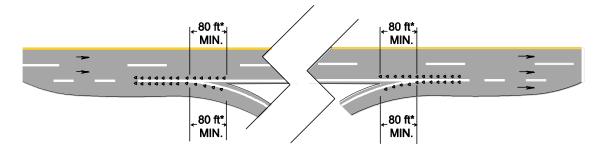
B-V2. Typical Raised Pavement Marker Layout Details (Sheet 2 of 2)
